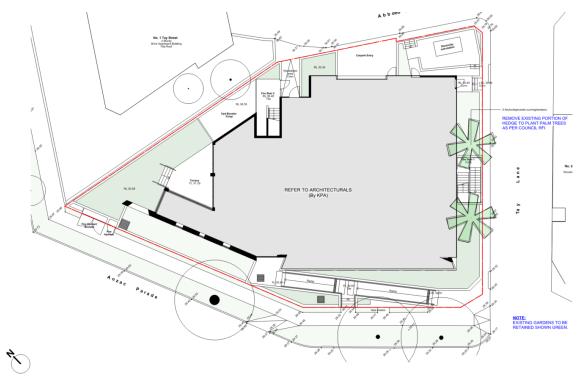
Ground Floor Landscape Plan (Source: Applicant)
